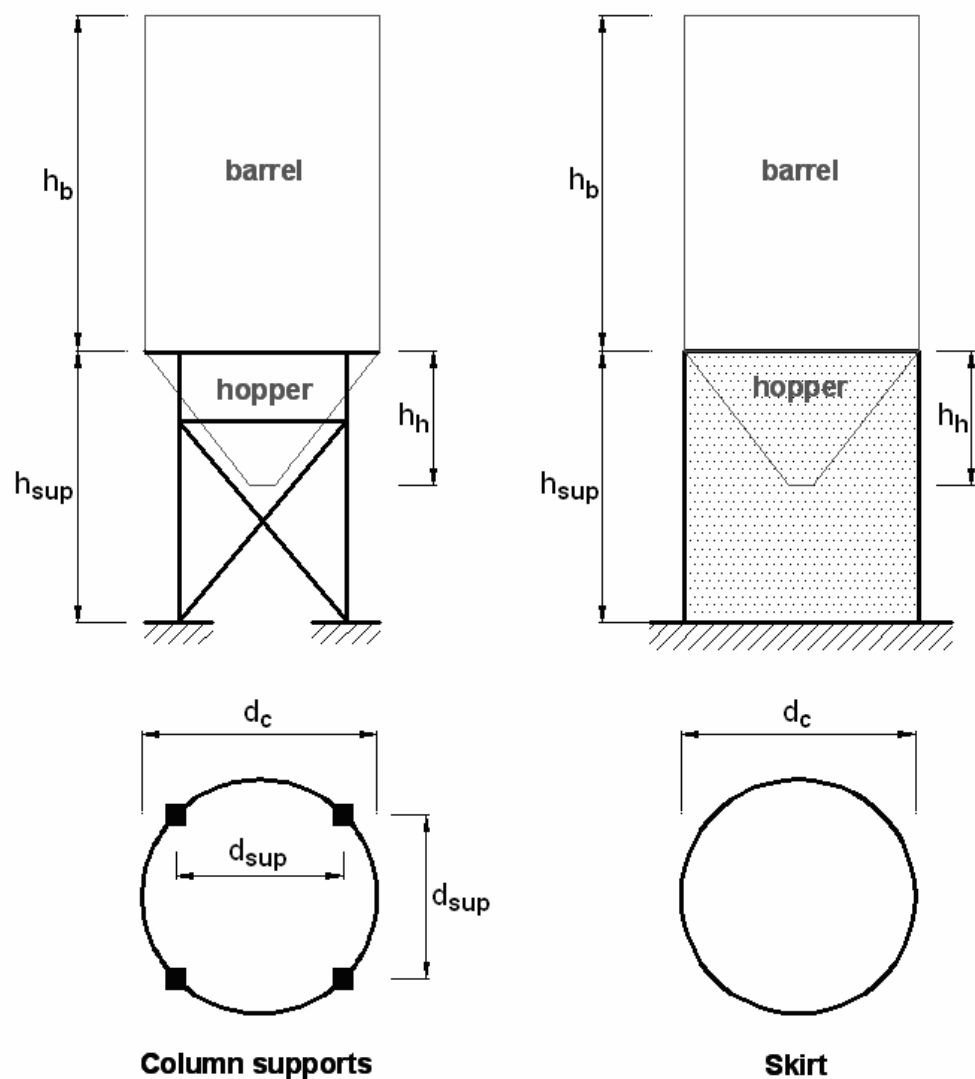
Typical elevated thin-walled cylindrical silo structures and support structures
